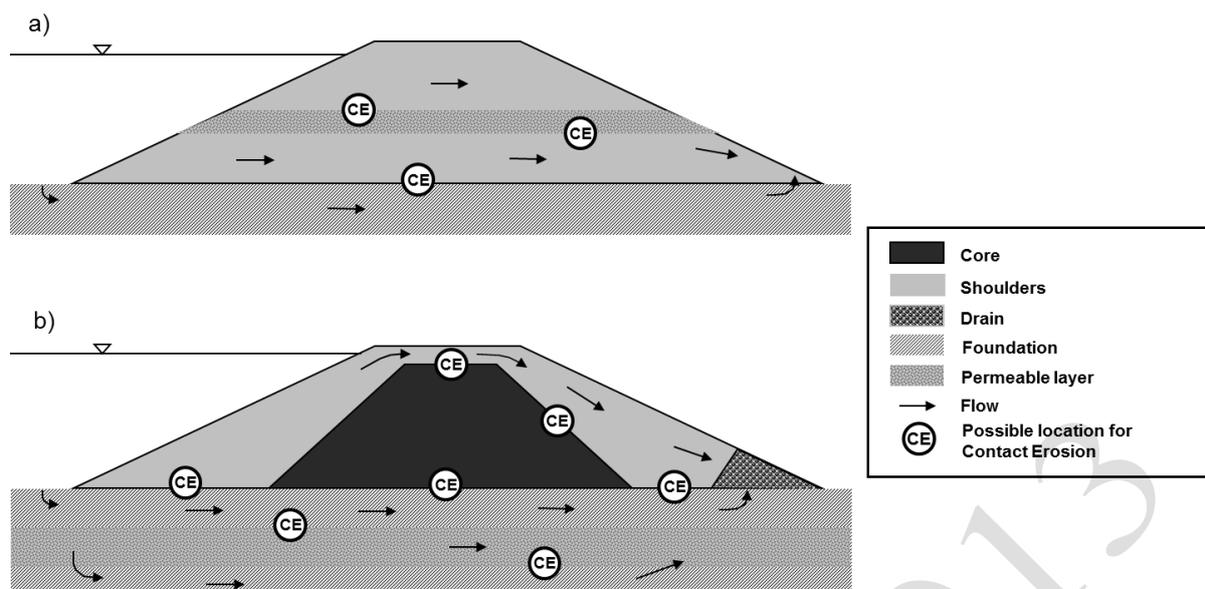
Possible location of contact erosion initiation. a) Homogeneous dam with layered fill due to segregation during construction and a coarse foundation soil. b) Zoned dam with potential for contact erosion at high reservoir levels above the core and for erosion into coarse layers in the foundation (Beguin et al, 2009).
